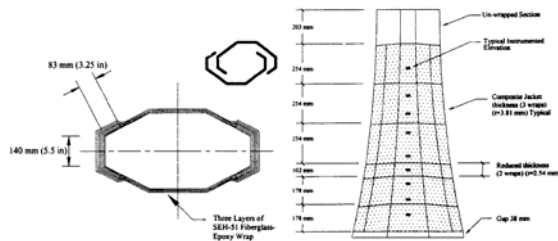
Example seismic retrofitting detail for a reinforced concrete column using a FRP jacket [7]
